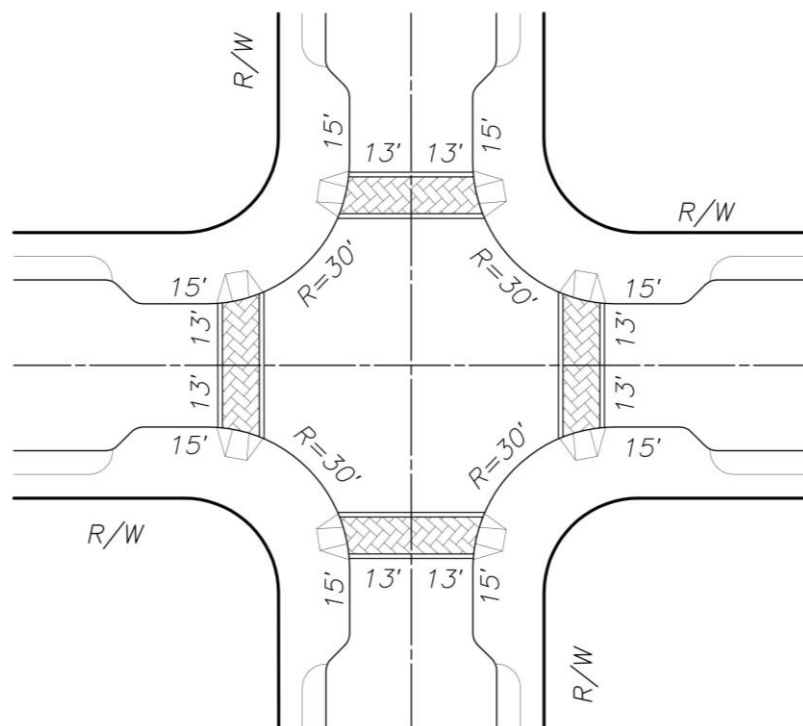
Parallel Bay Parking with Landscaped Pop-Outs
